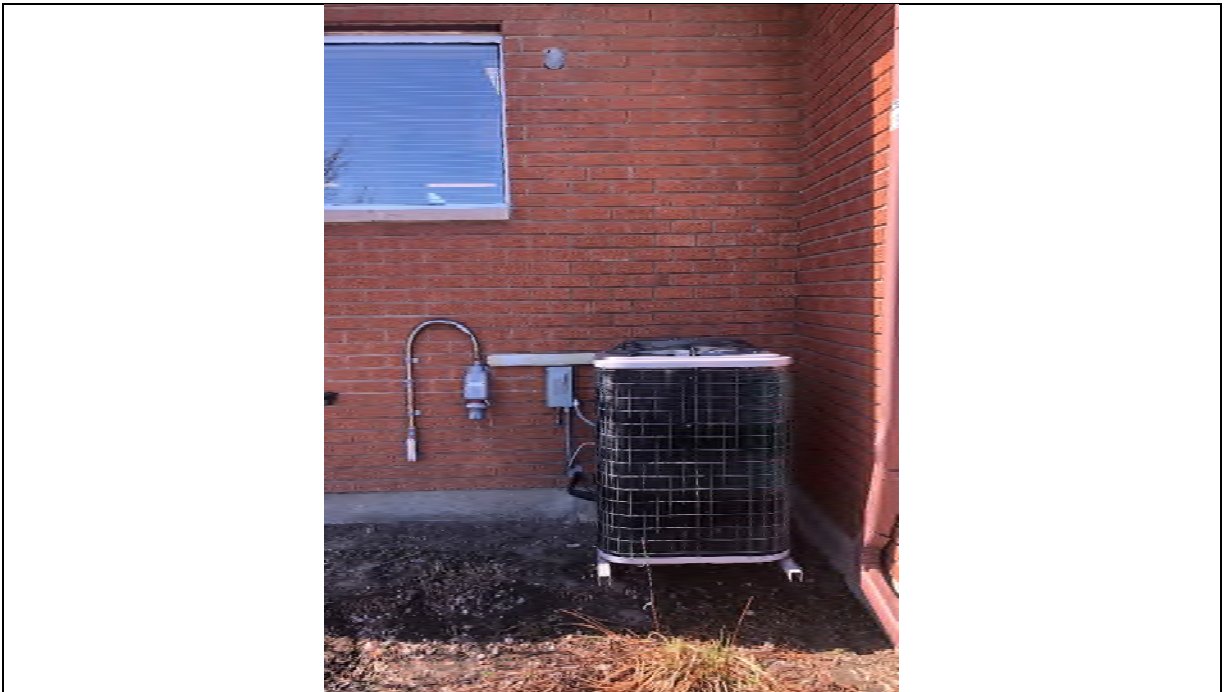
View of the air conditioning unit for the site building, located on the northern exterior building wall (facing south).
